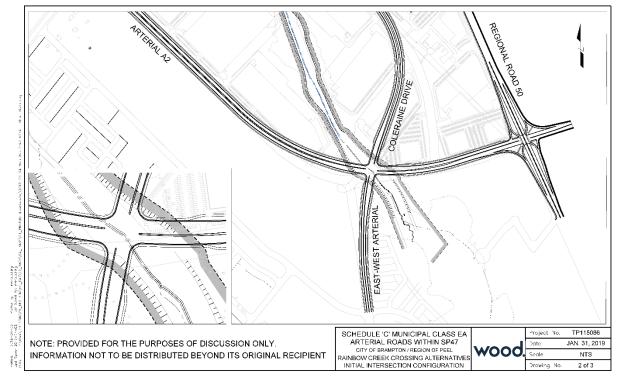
Roadway Design Alternative 1 - Intersection Within the NHS
